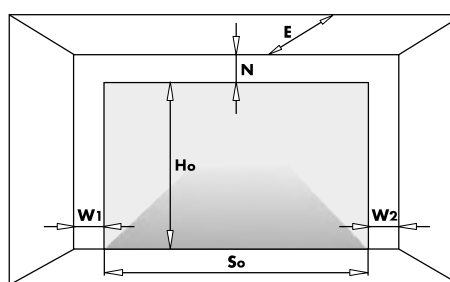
The assembly dimensions and designations thereof required for correct selection and assembly of sectional industrial doors.
